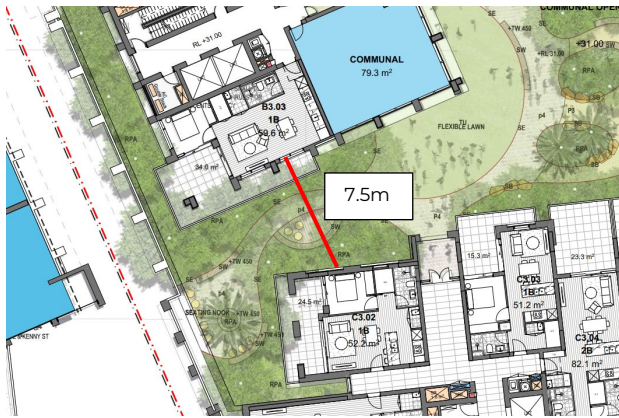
Building Separation Between Building 2.1 and Building 2.2 on Level 3
